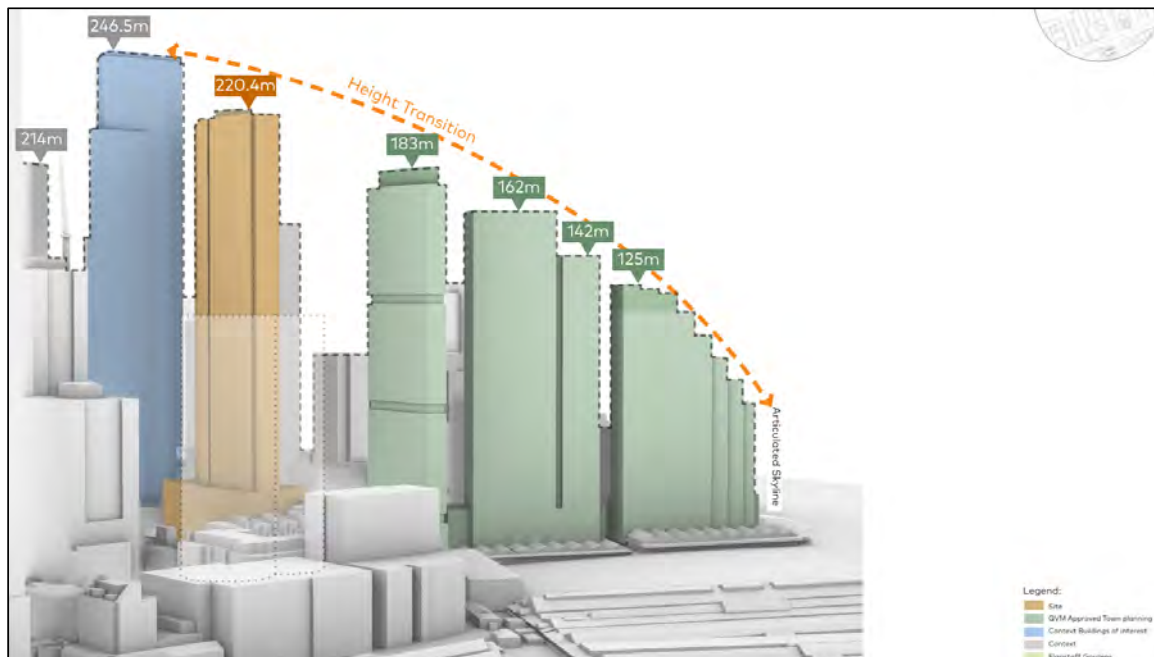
Massing diagram illustrating proposed height in relation to QVM and surrounding built form (Source: Applicant dated June 2025)
